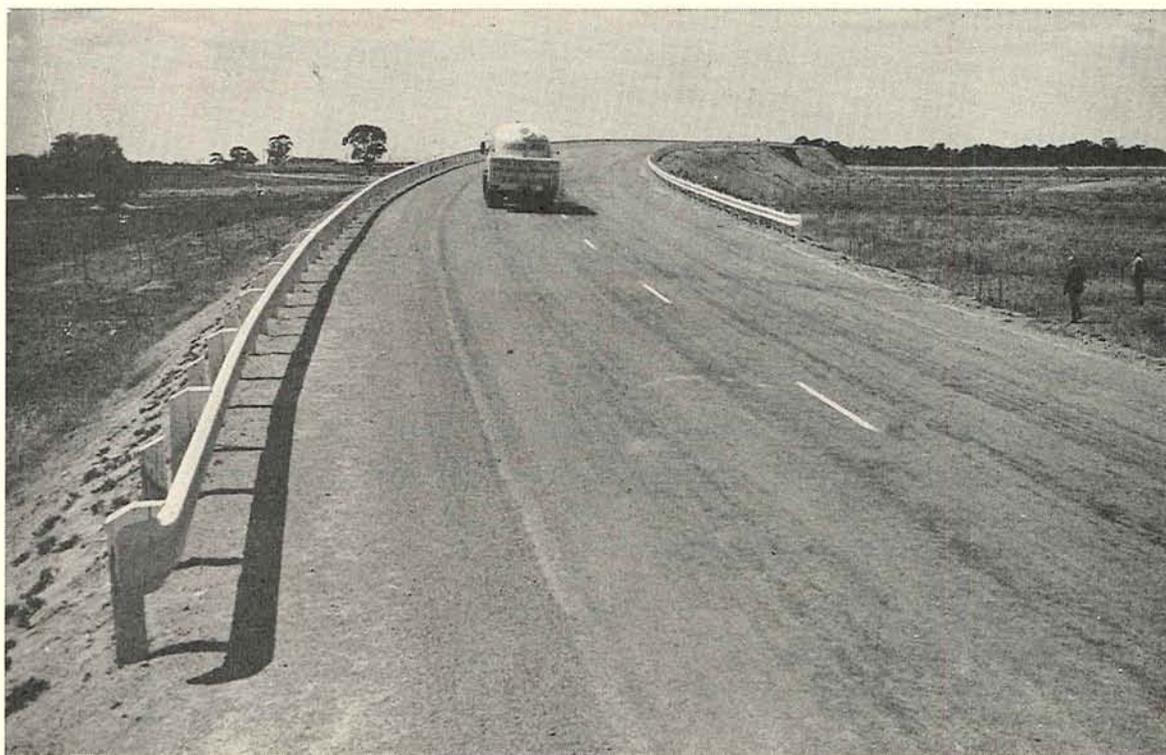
Completed overpass at Wail on the Western Highway, Shire of Wimmera.
